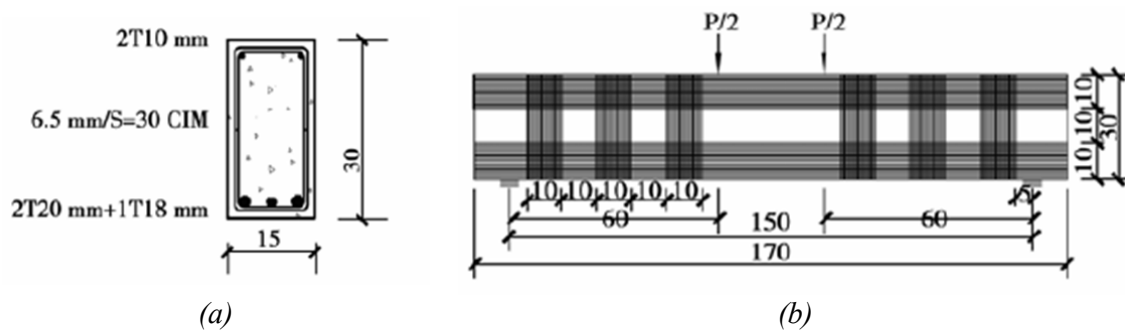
(a) longitudinal reinforcement, (b) strengthening scheme (dimensions in cm) (Alzoubi et al. 2007)
